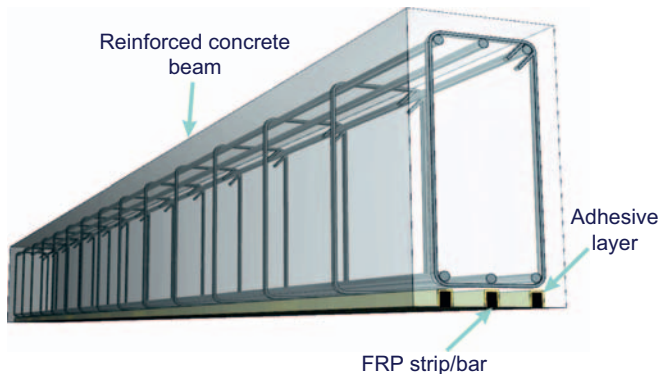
The near surface mounted strengthening technique of reinforced concrete (RC) beams.
